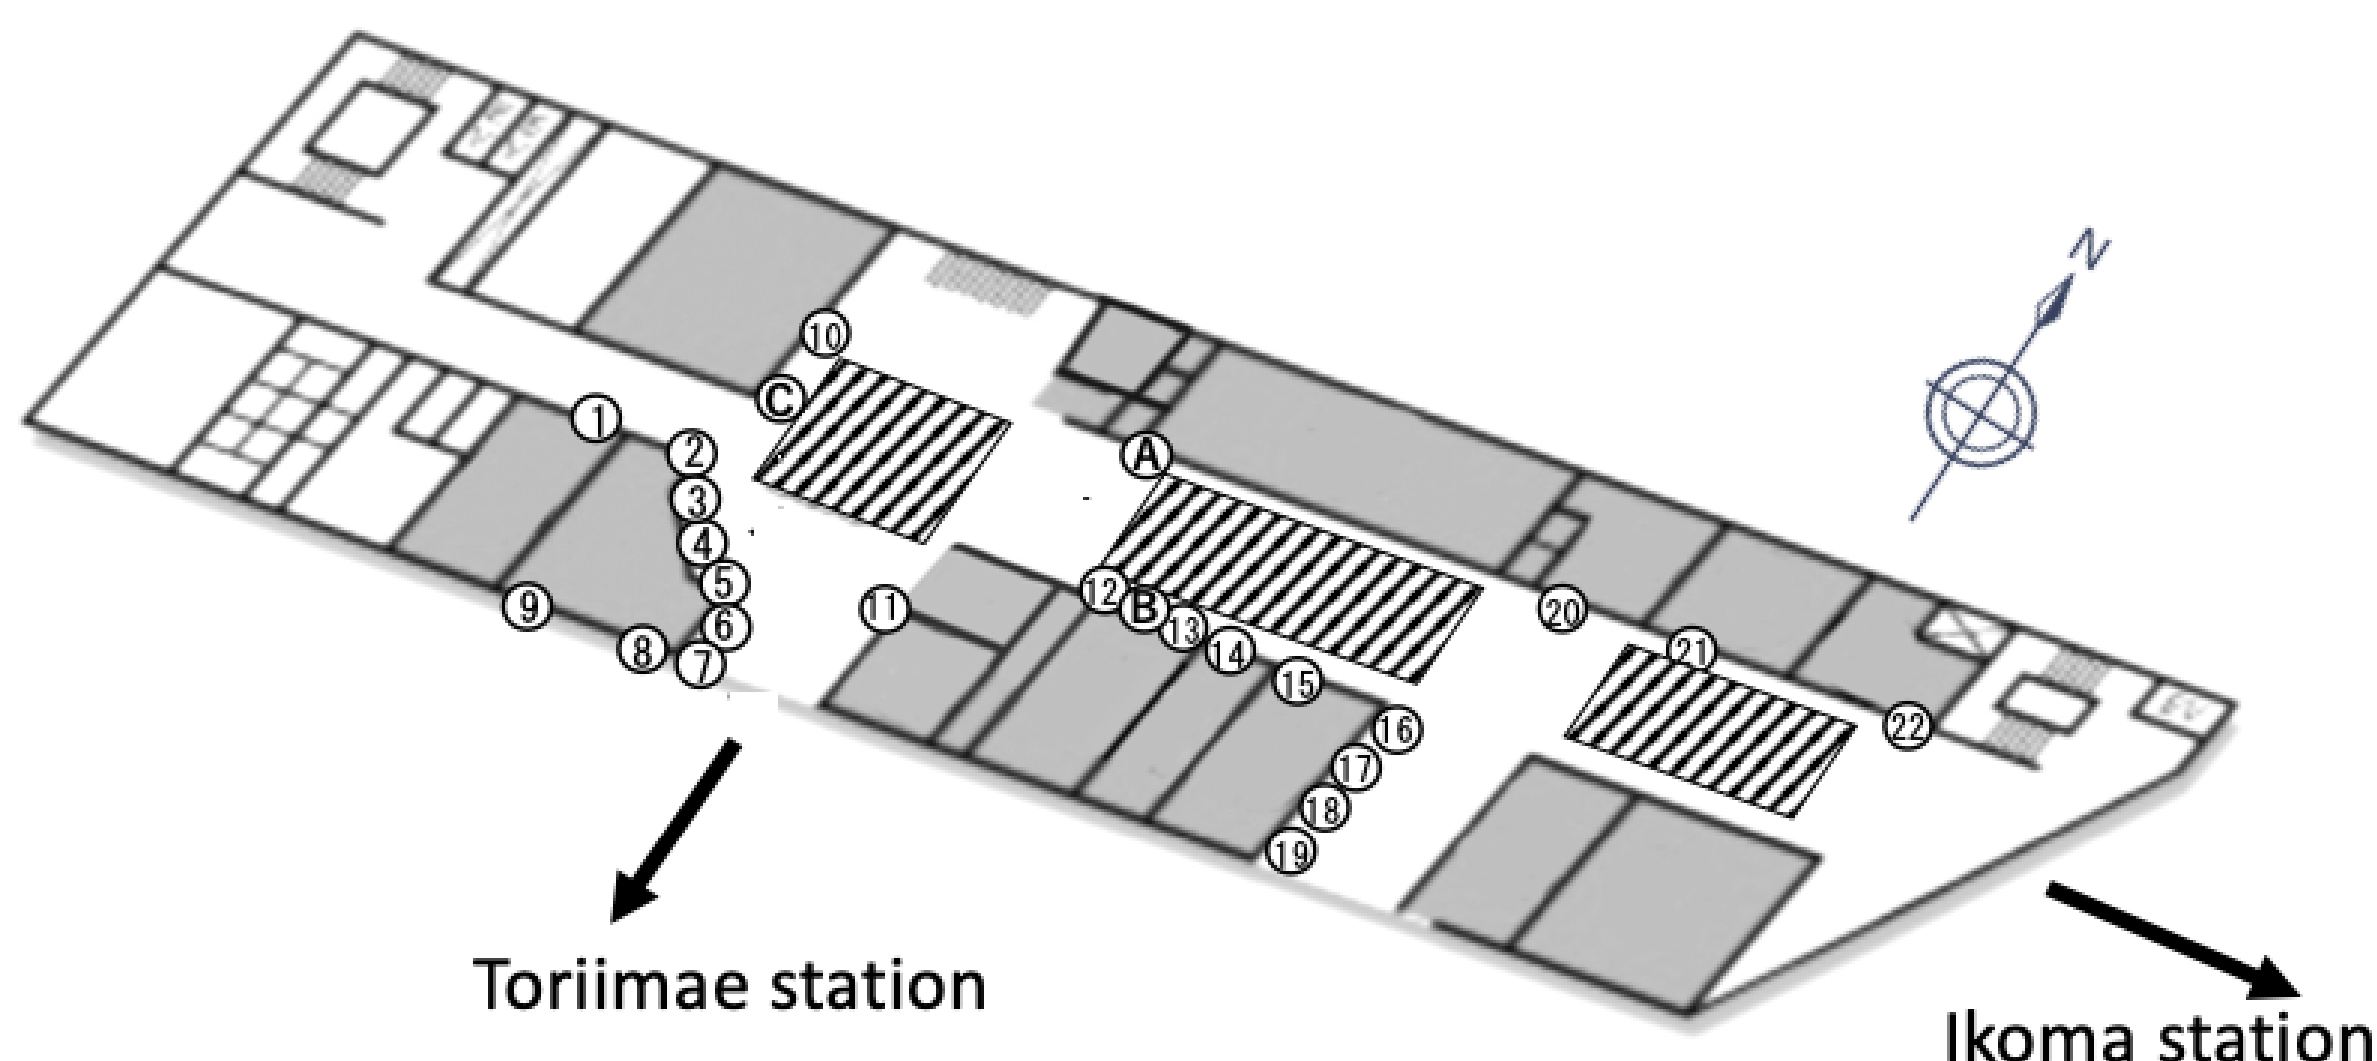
Green Hill Ikoma Floor Plan 2024 (3rd floor).
